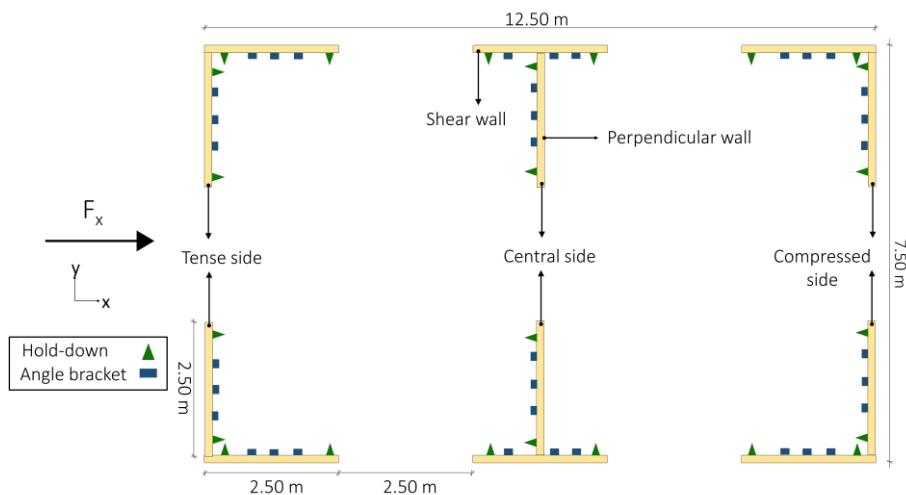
Floor plan of the one-storey CLT building and distribution of the wall base connections.
